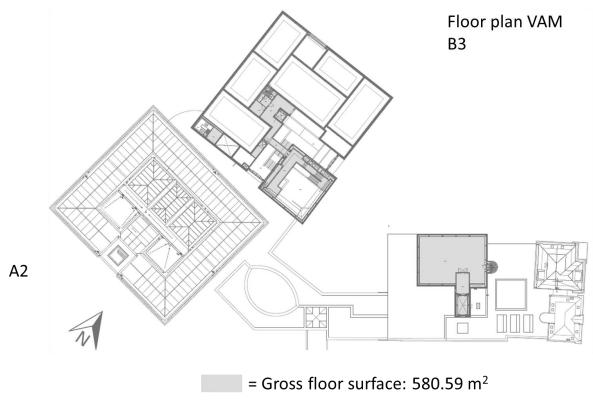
Floor plan A2 and B3, floor plan under layer by Cahen (2003).
